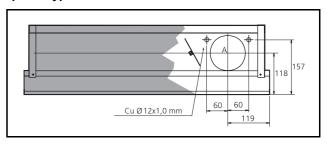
Suspension: SYST MS assembly set, end view. A = M6 threaded rod
